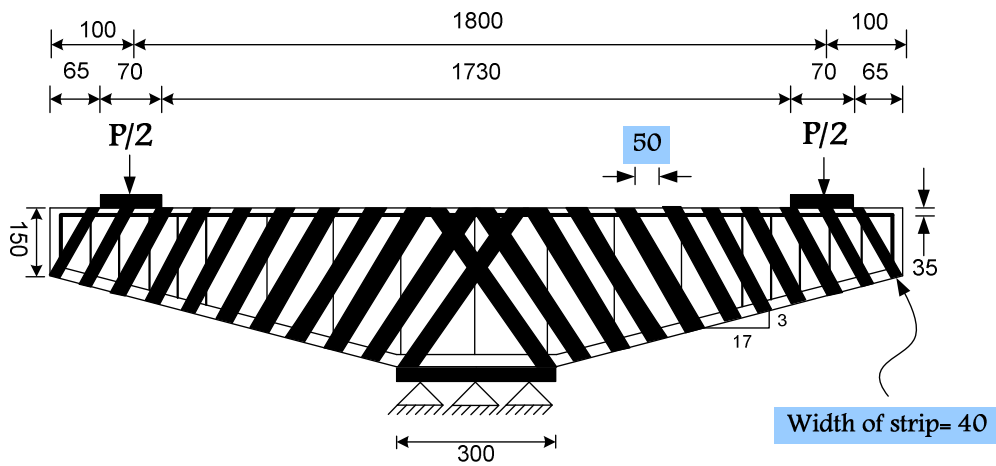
Details of Tapered Beam (TB-0.5S-C45°)
